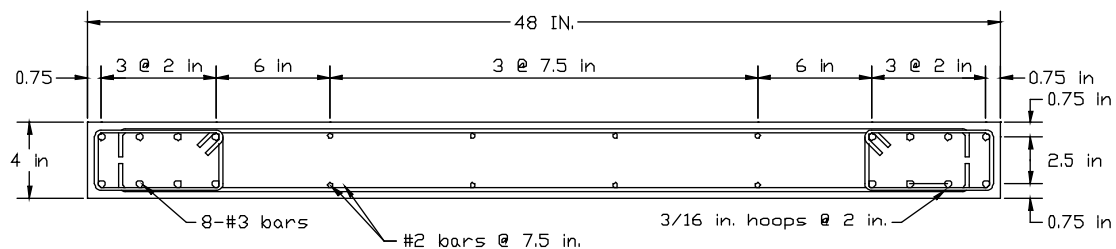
Cross-section details of Thomsen and Wallace's specimen RW2
